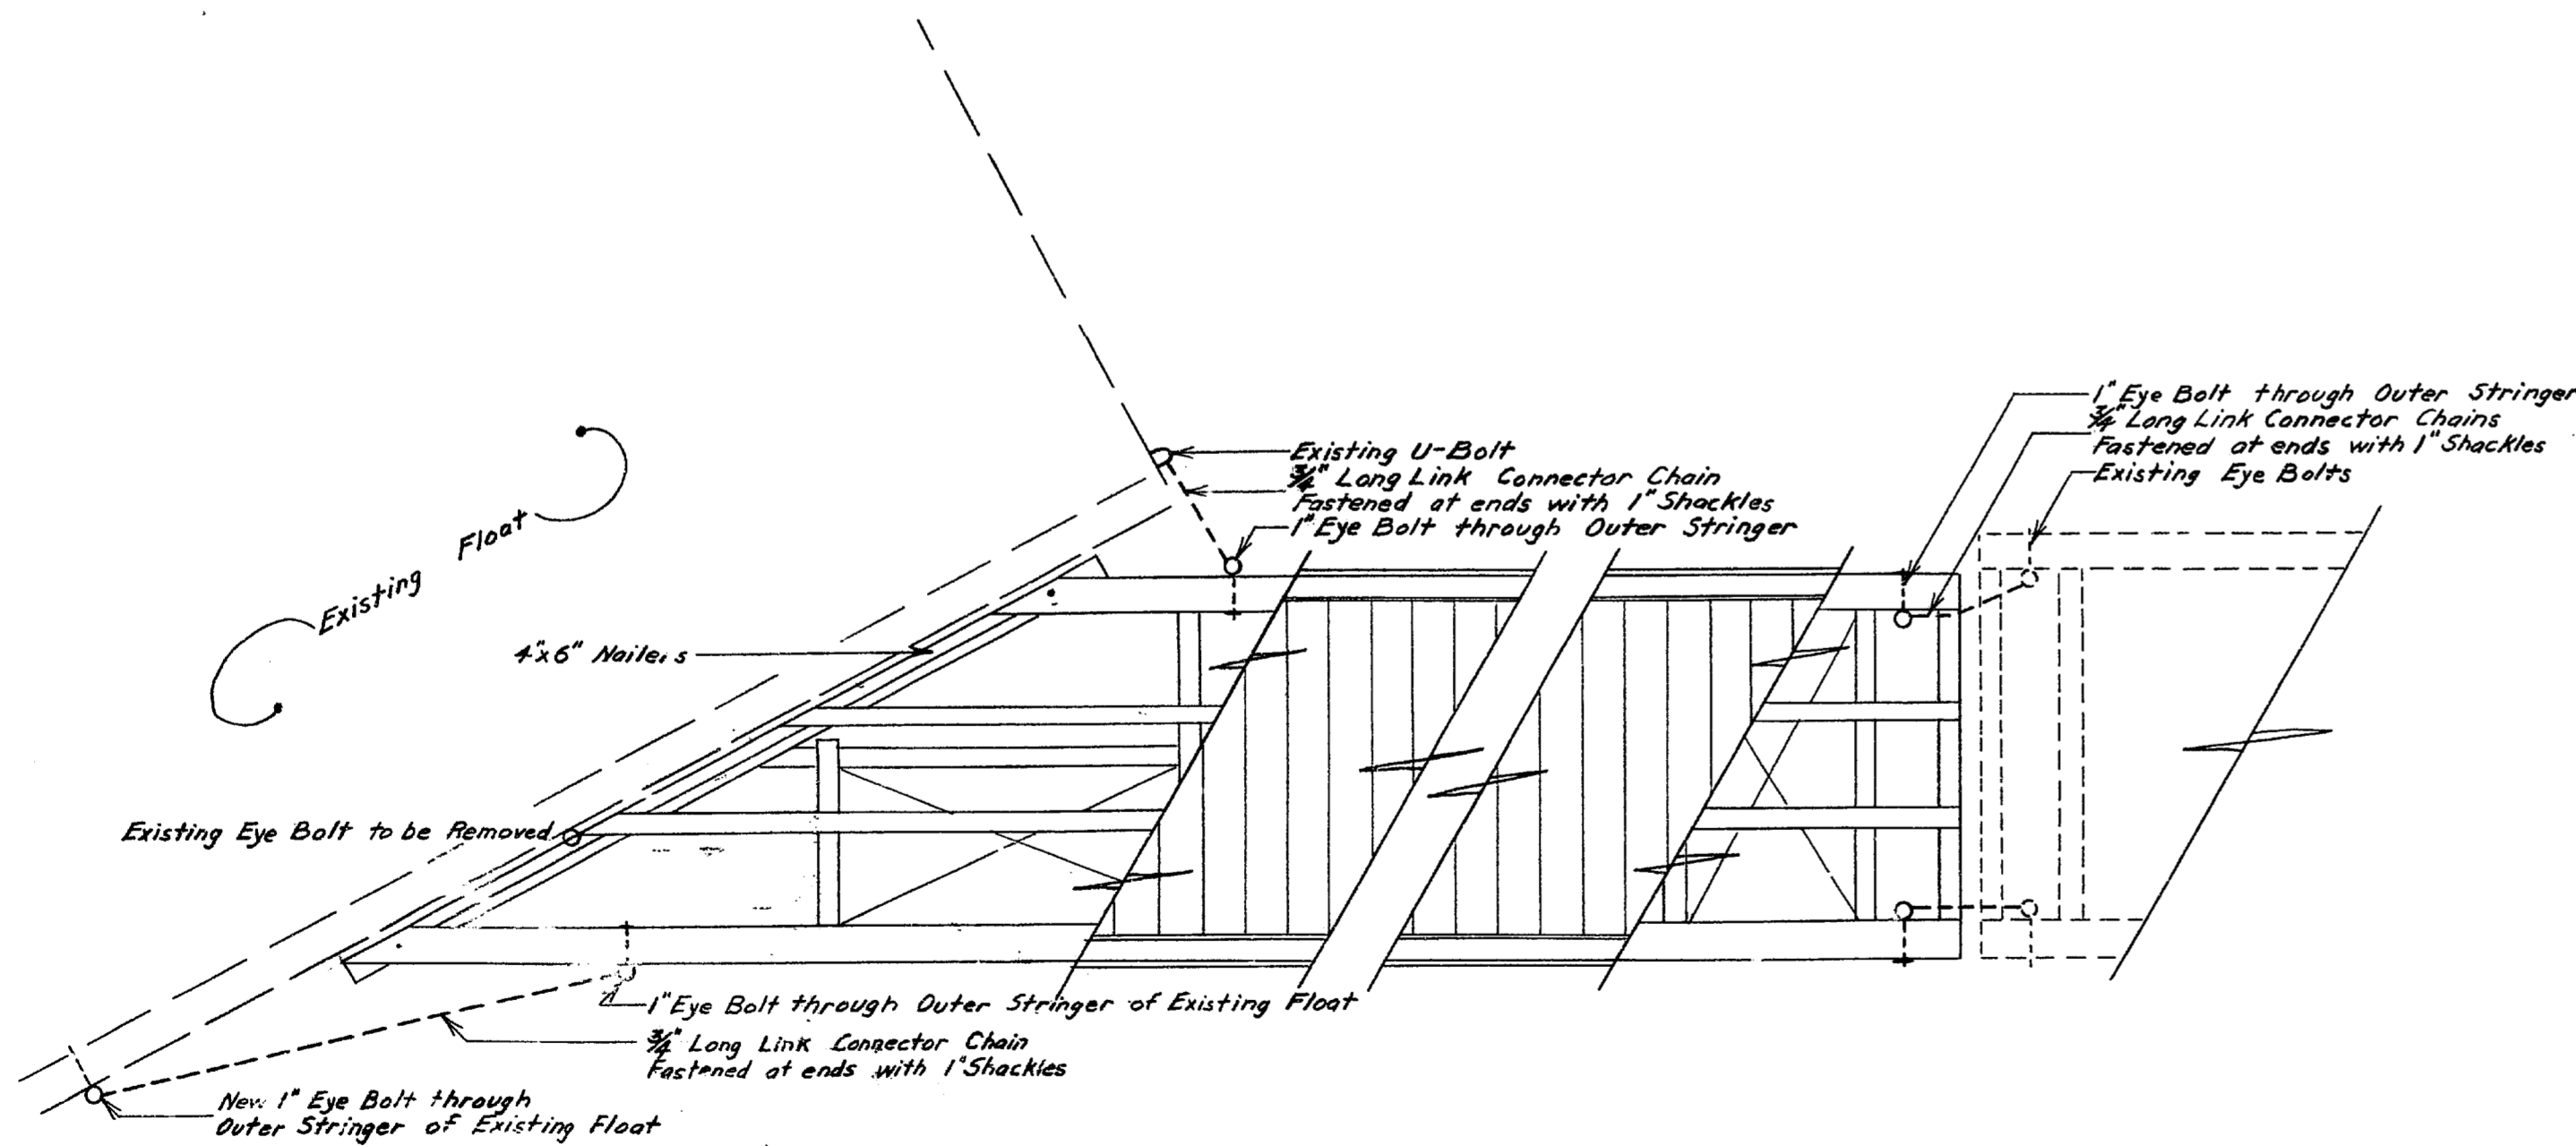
FLOAT CONNECTION DETAIL FLOAT "C"
